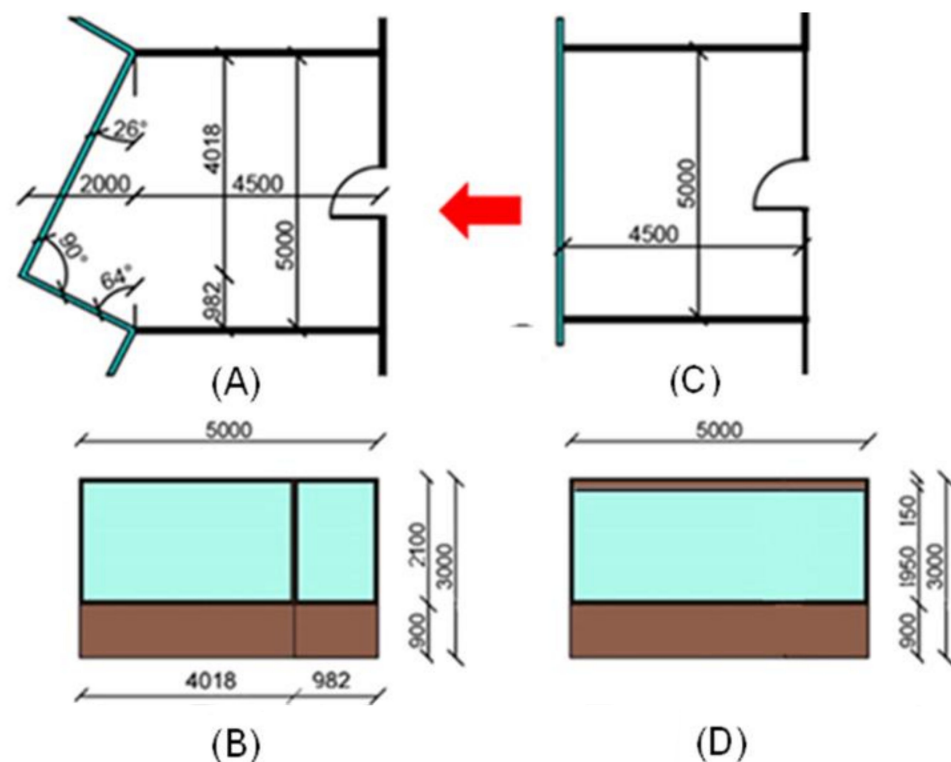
Design illustrations showing specifications for an office with a flat or a multi-angled façade. (A) A plan of multi-angled façades utilised within an office room. (B) A façade utilising multiple orientation angles. (C) A flat façade plan. (D) Flat façade.
